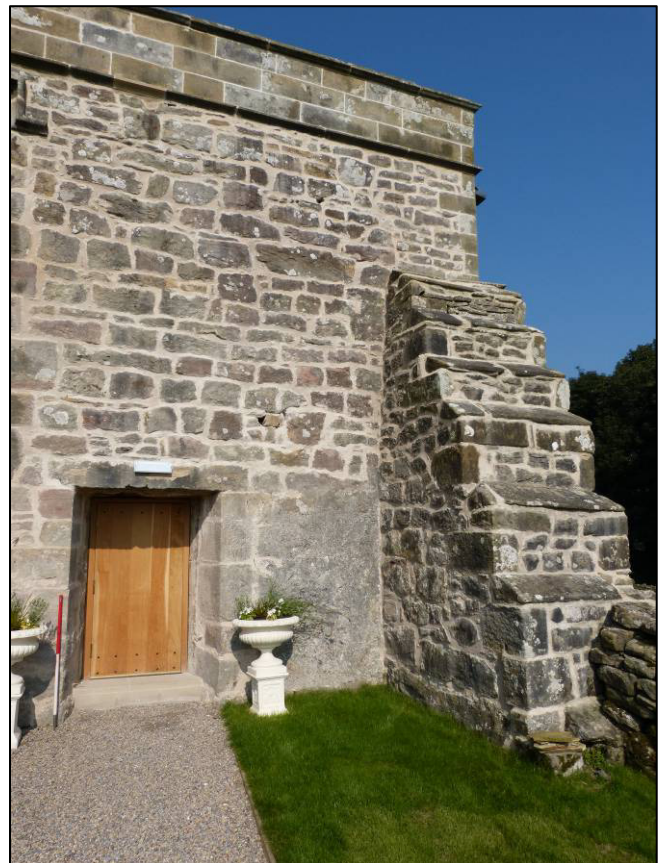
Chapel, east end of south elevation, works complete, looking N (photo 7/586).
